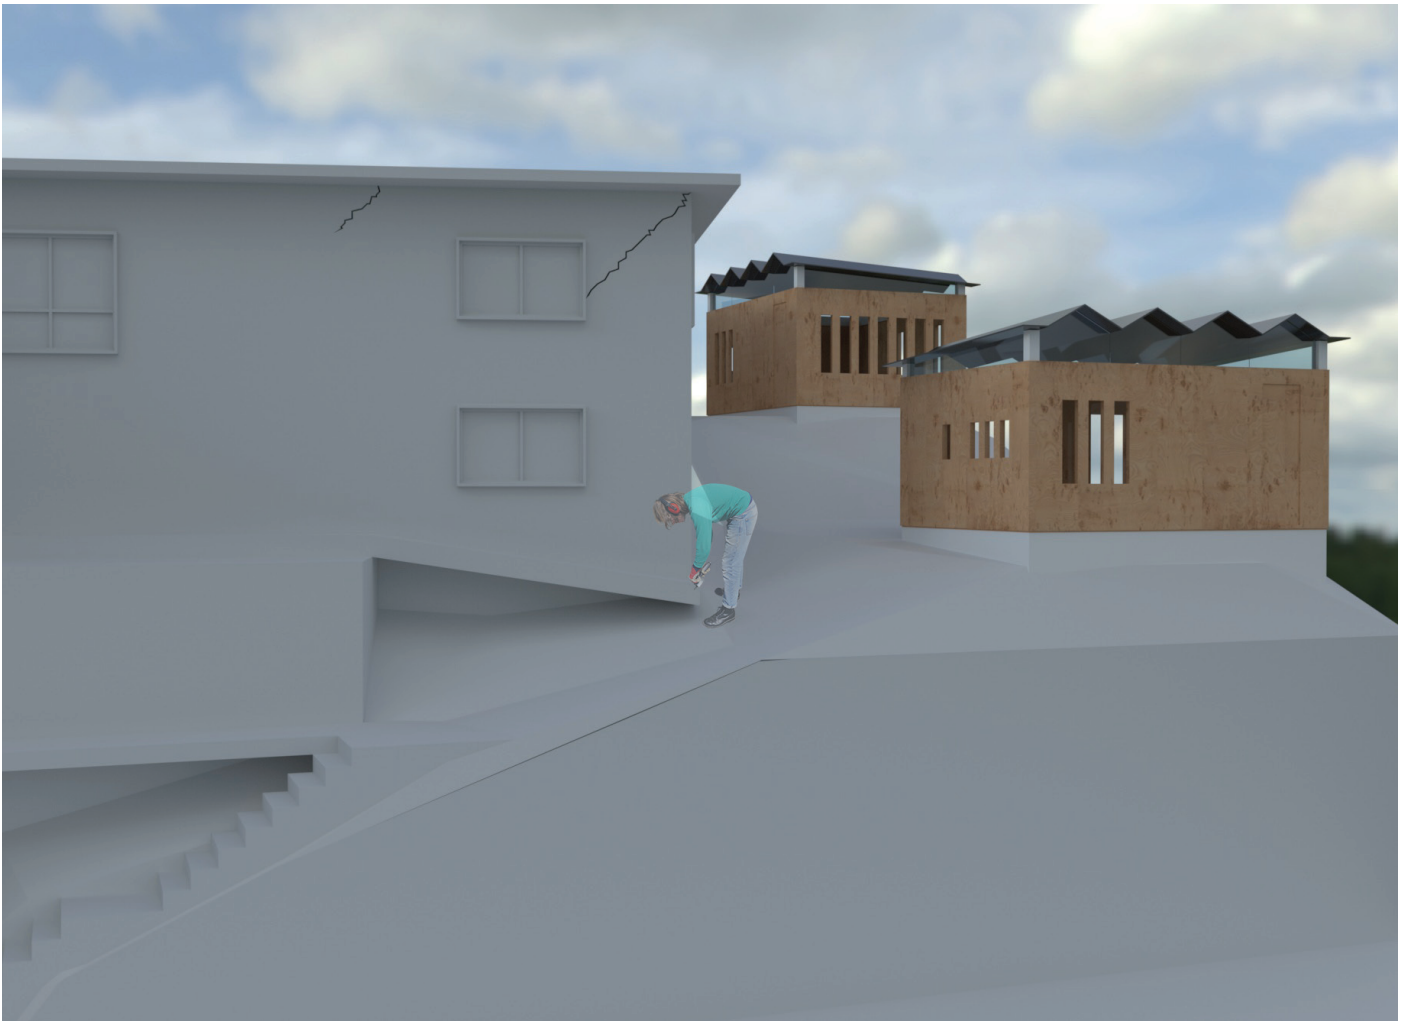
1 day post-disaster. The cladding panels are deployed. The transitional shelters are located on the only occupiable land on site.
